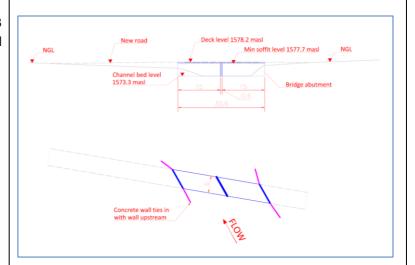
Cross section and layout of the proposed new bridge at site 8 (2nd Street, Parkhurst)
